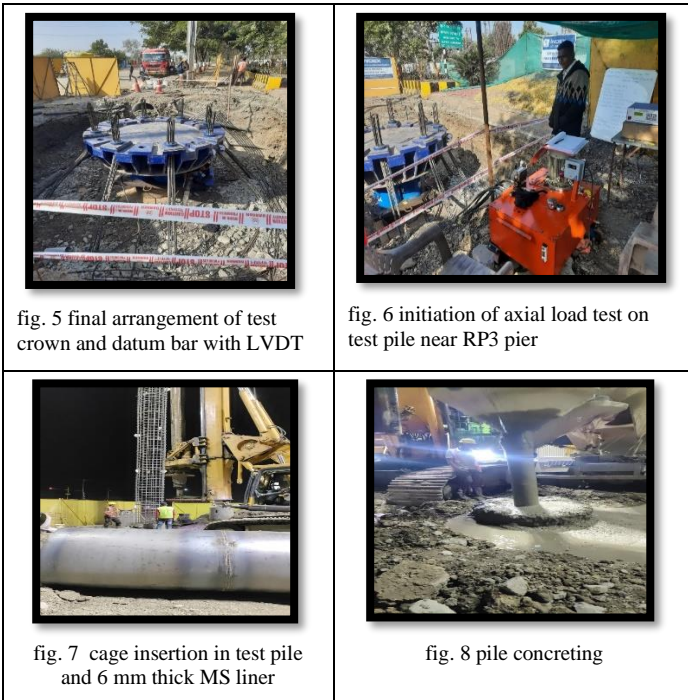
final arrangement of test crown and datum bar with LVDT
